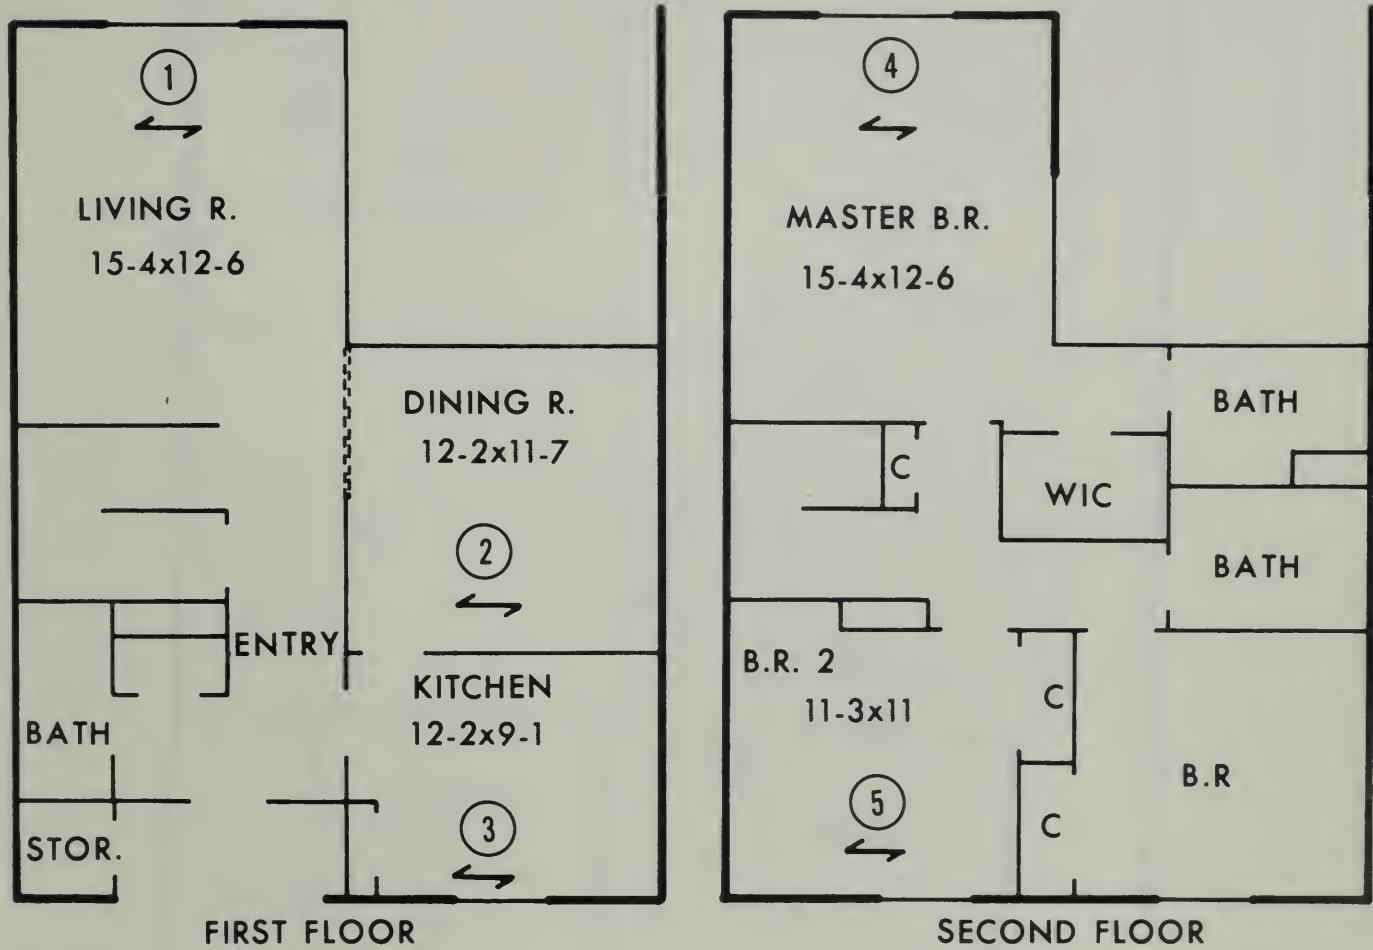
FLOOR PLAN OF HOUSE NO. 3
